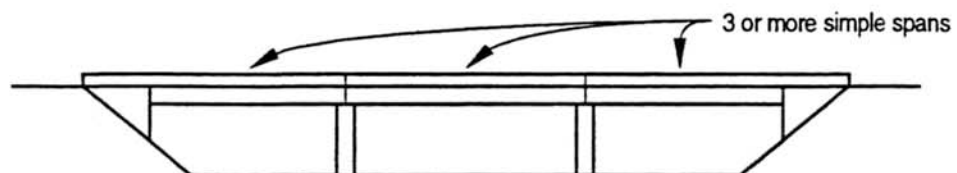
A dynamic analysis for column and abutment forces should be considered for any bridge with two or more hinges.
